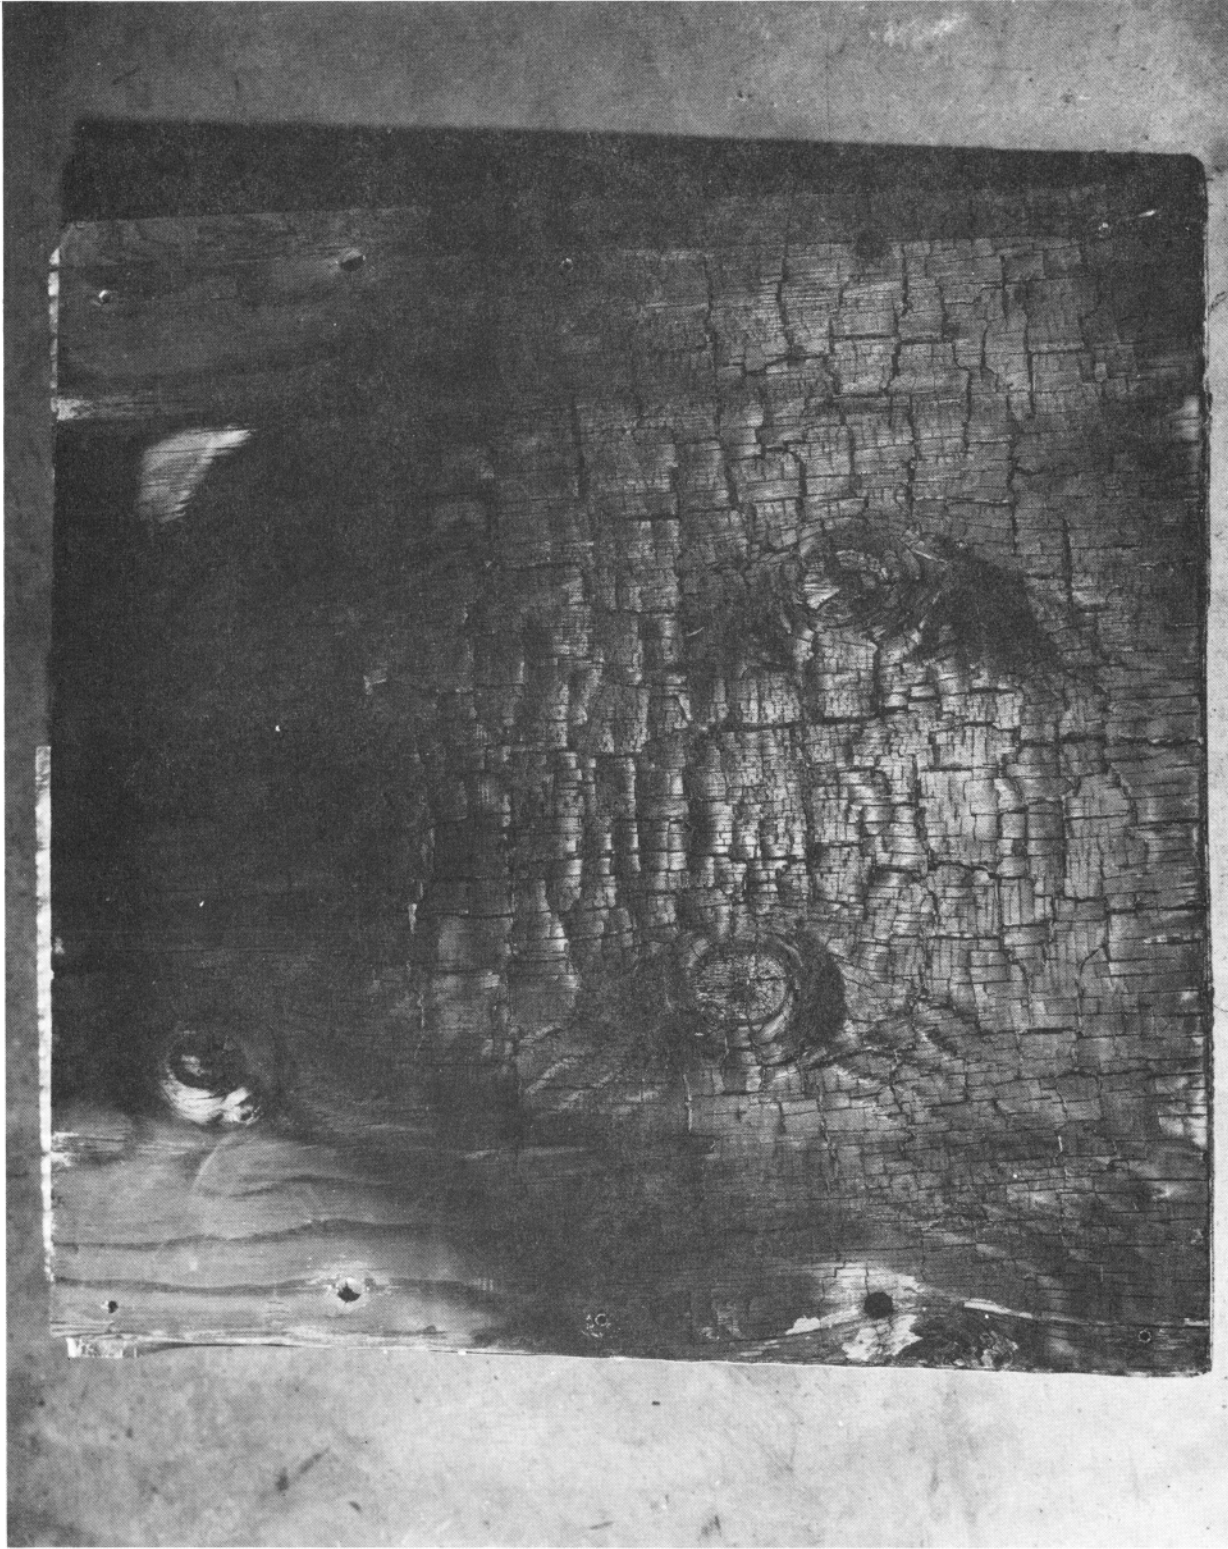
CHARRING OF THE PLYWOOD FLOORING SEPARATED FROM THE CORRUGATED METAL BY AN AIRSPACE
